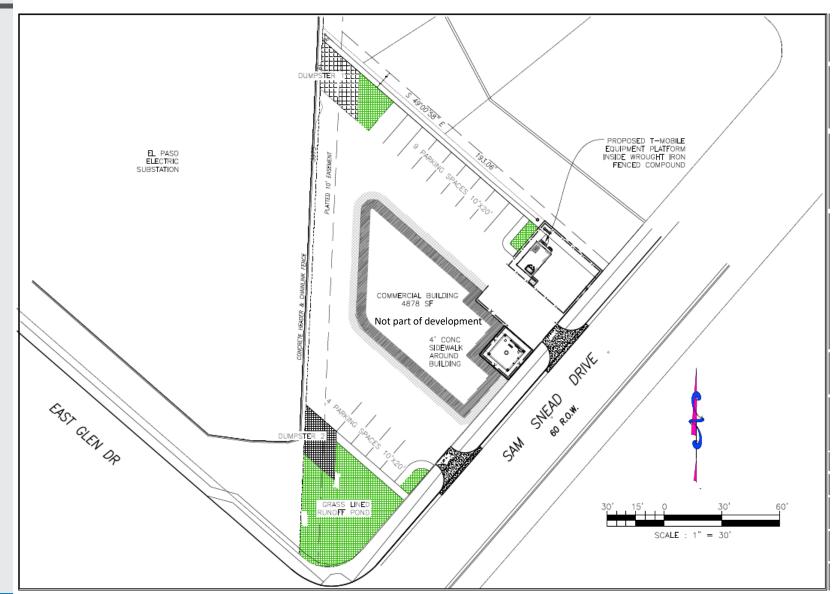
DETAILED SITE DEVELOPMENT PLAN FOR A POTENTIAL FUTURE NEIGHOBRHOOD COMMERCIAL
